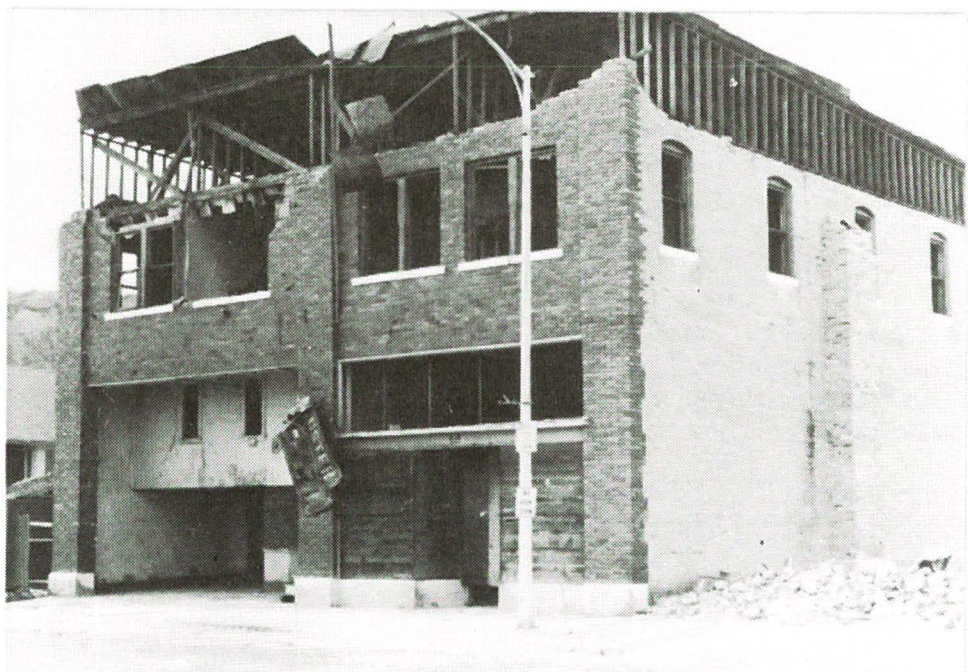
ROOF TRUSS MOVEMENT KNOCKED HIGH PARAPETS;
